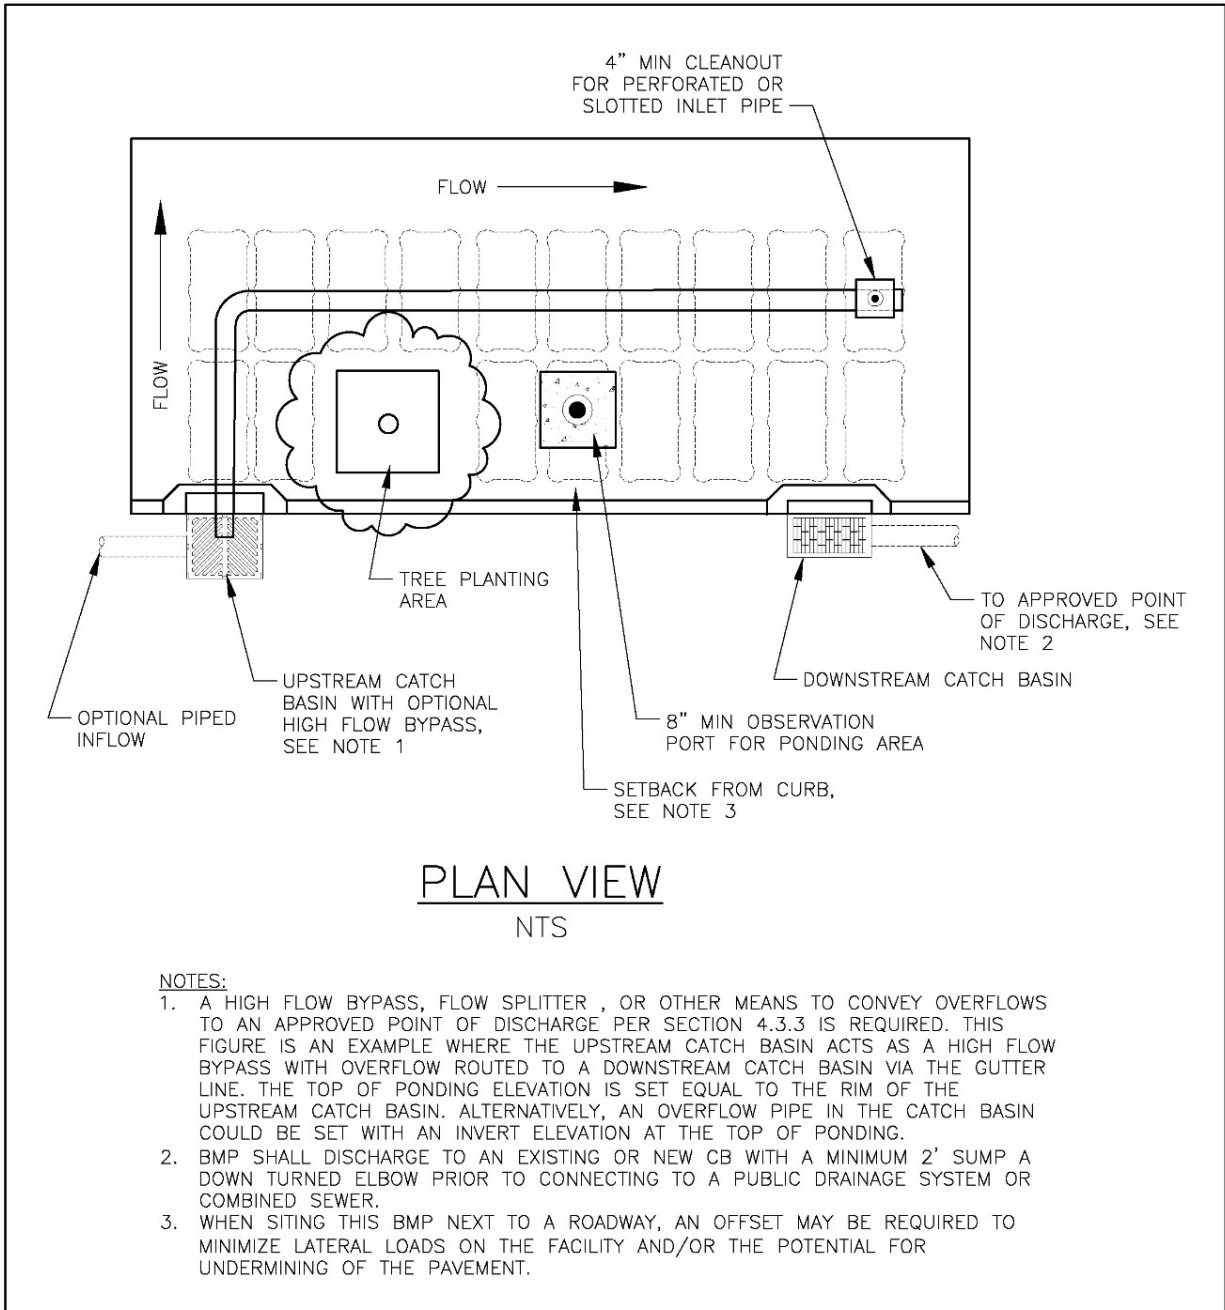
Infiltrating Soil Cell Bioretention (without Underdrain) Plan.
